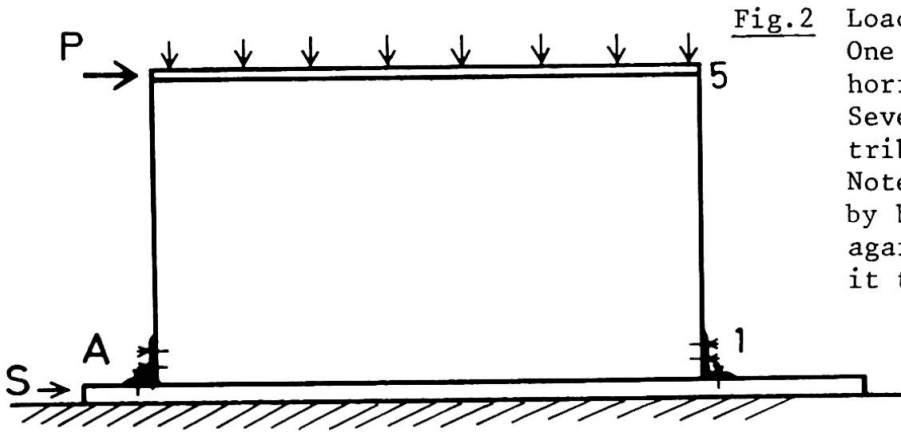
Loading arrangement. One large hydraulic jack for horizontal racking force P. Several small jacks for distributed vertical top load. Note steel angles attached by bolts to secure wall against uplift by anchoring it to the bottom sill (S).
